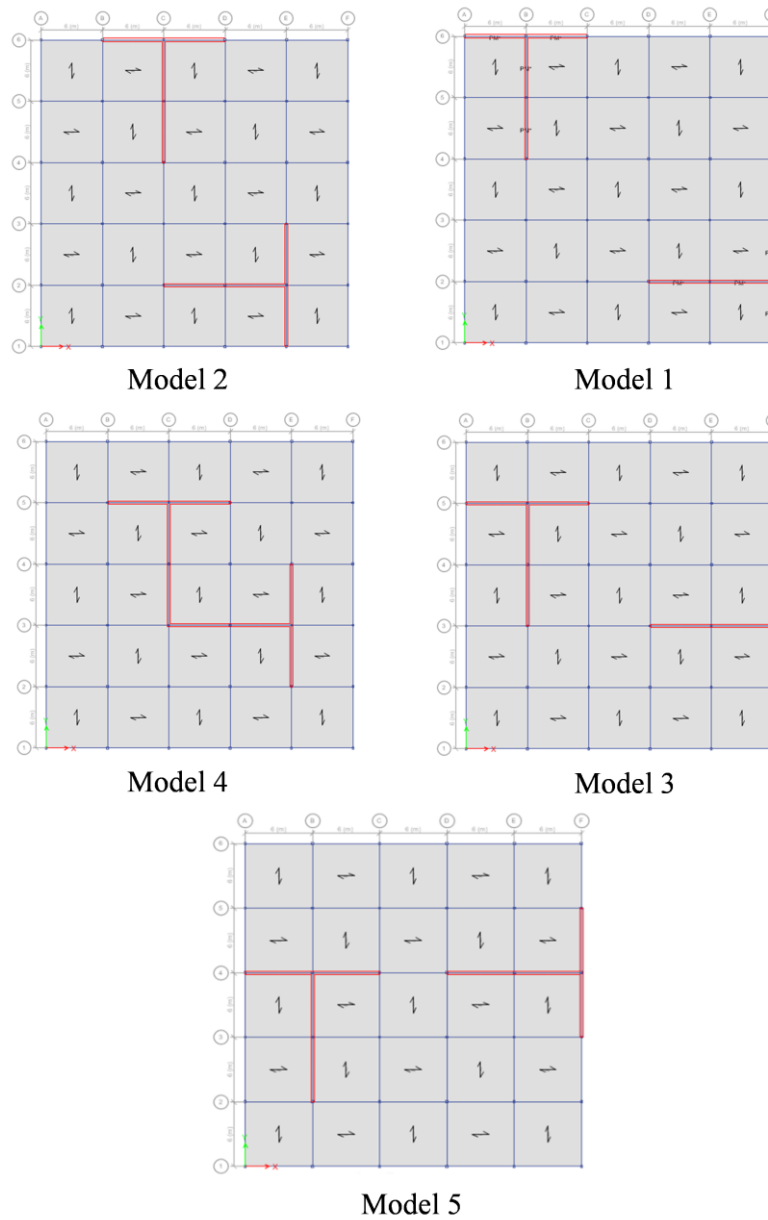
Arrangements of T-shaped shear walls in the building plan.
